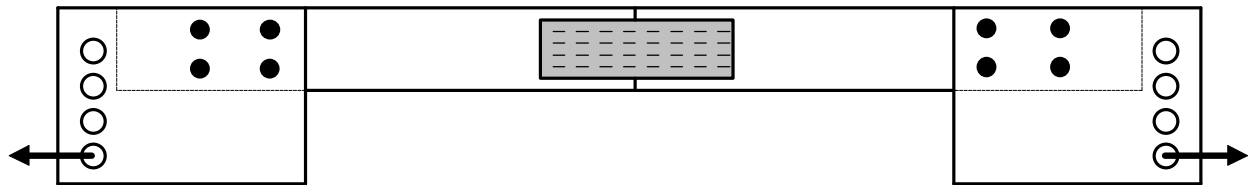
2x4 test joint with grip plates bolted onto each end.
